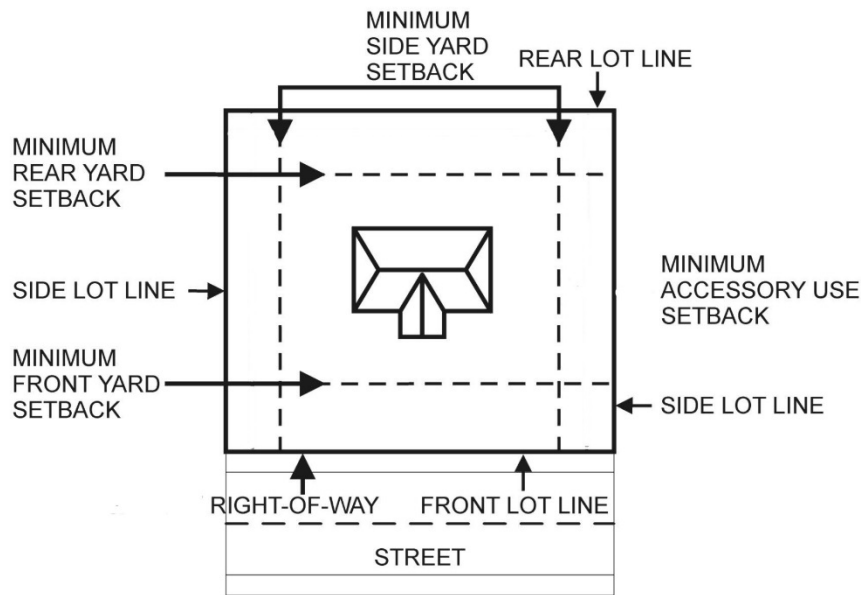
Typical setbacks measurements on an interior lot.
